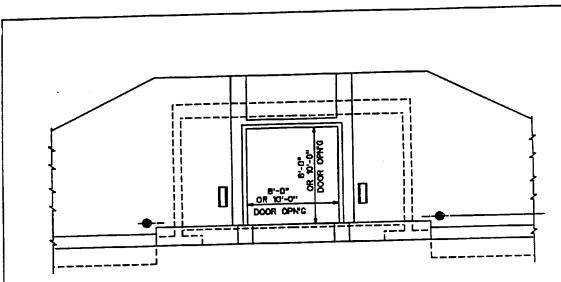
STEEL AND CONCRETE BOX MAGAZINE, EARTH-COVERED
